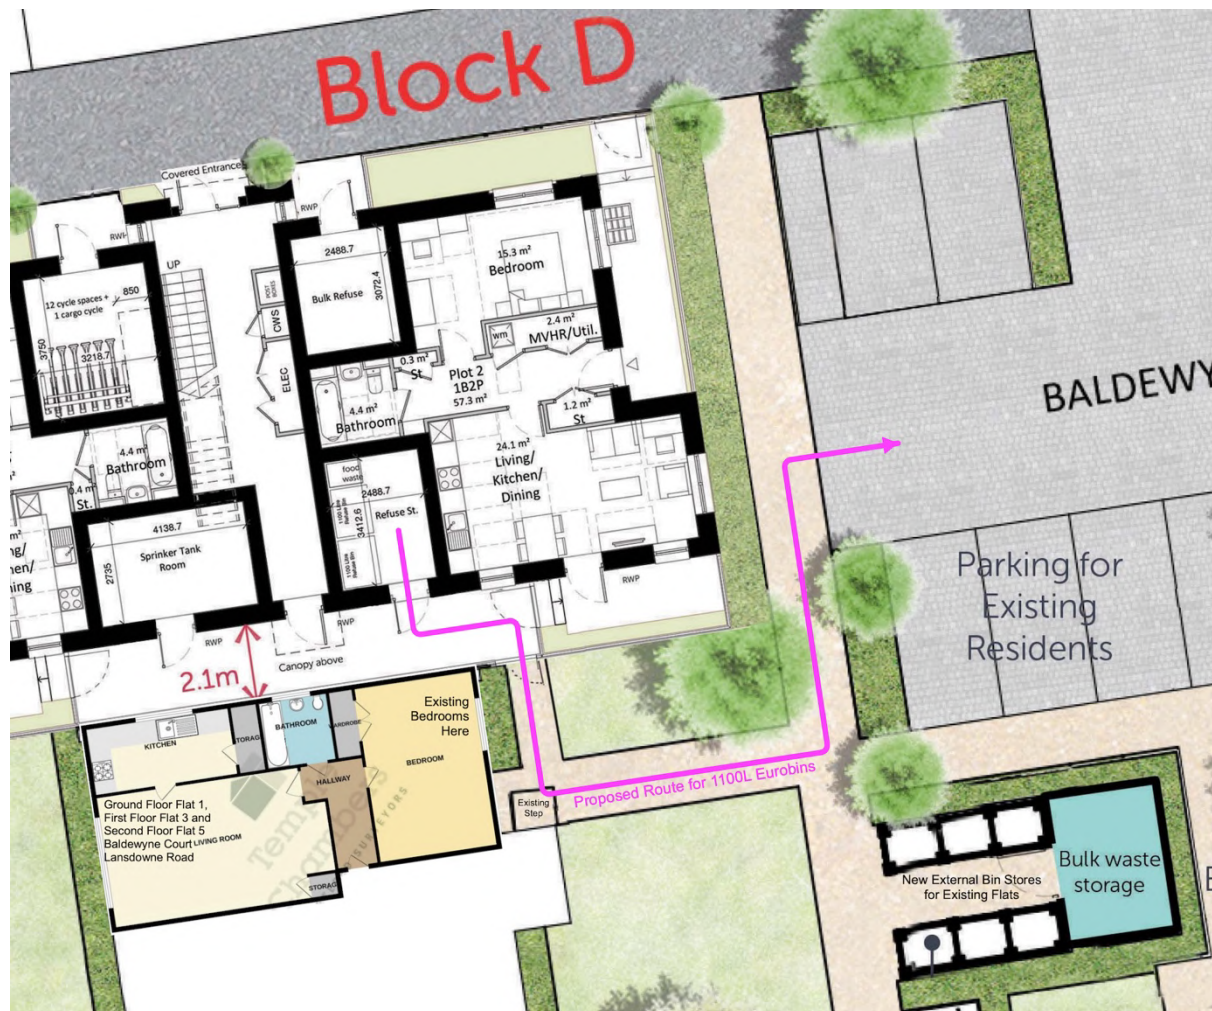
An annotated ground floor plan showing the convoluted route that 1100L Eurobins will have to be taken on (pink line) for collection and return. The bins will be dragged past existing residents' bedrooms causing noise and disturbance.
